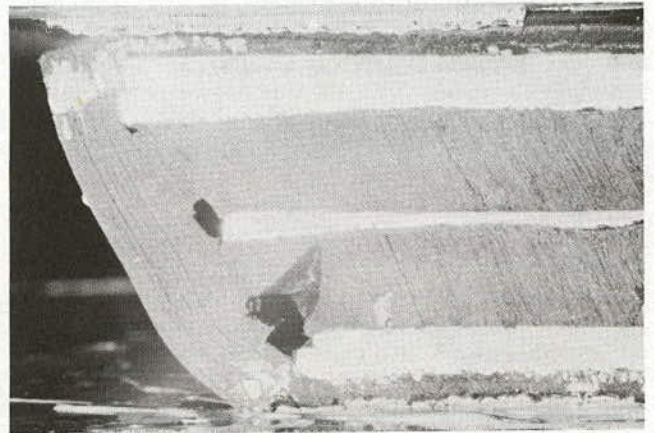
Photograph of shear fatigue cracking in a bearing with edge cover.
